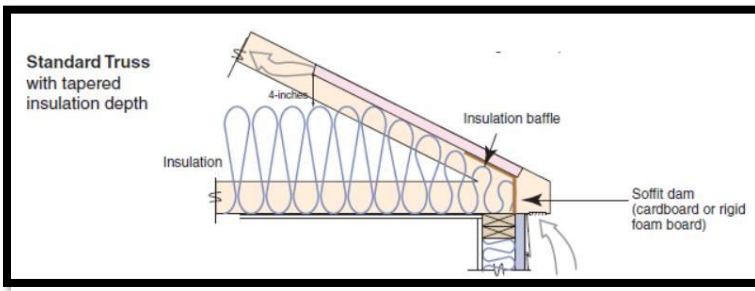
Standard truss with attic space. Source: [Attic Eave Minimum Insulation | Building America Solution Center \(pnnl.gov\)](#)
